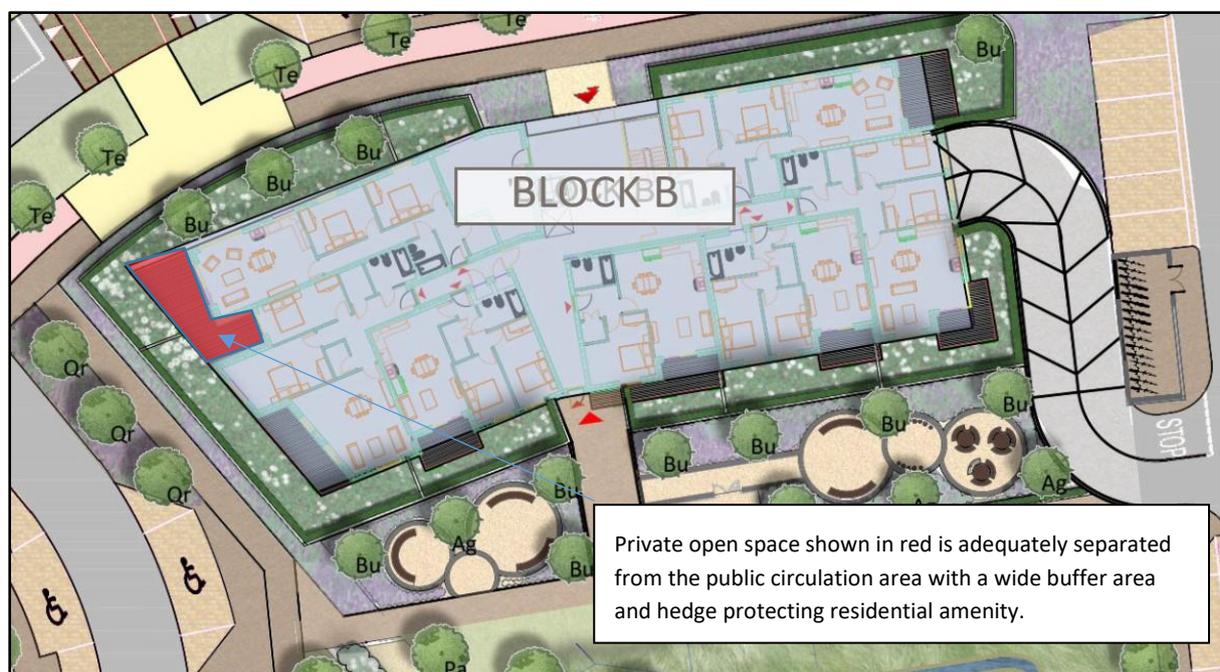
Extract from landscape plan demonstrating division of open space for Block B
